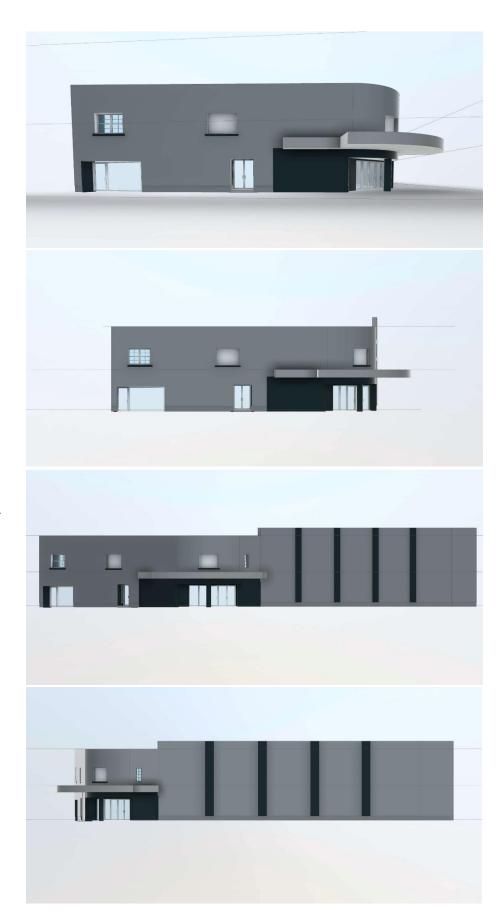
Photo capture of 3D Building Information Model (BIM) of the property, street view. If/Then Architecture Inc.
